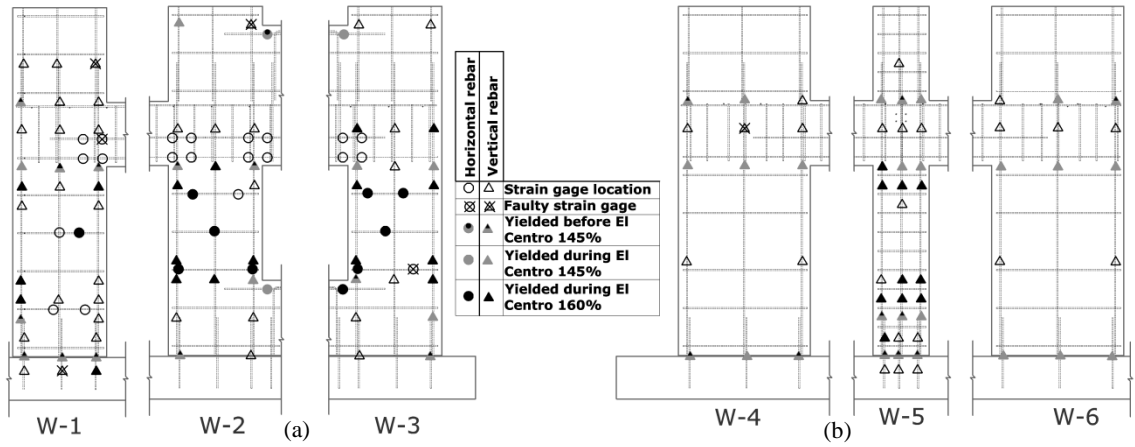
Yielding of reinforcement for a) interior wall and b) west exterior wall up to 160% El Centro.
